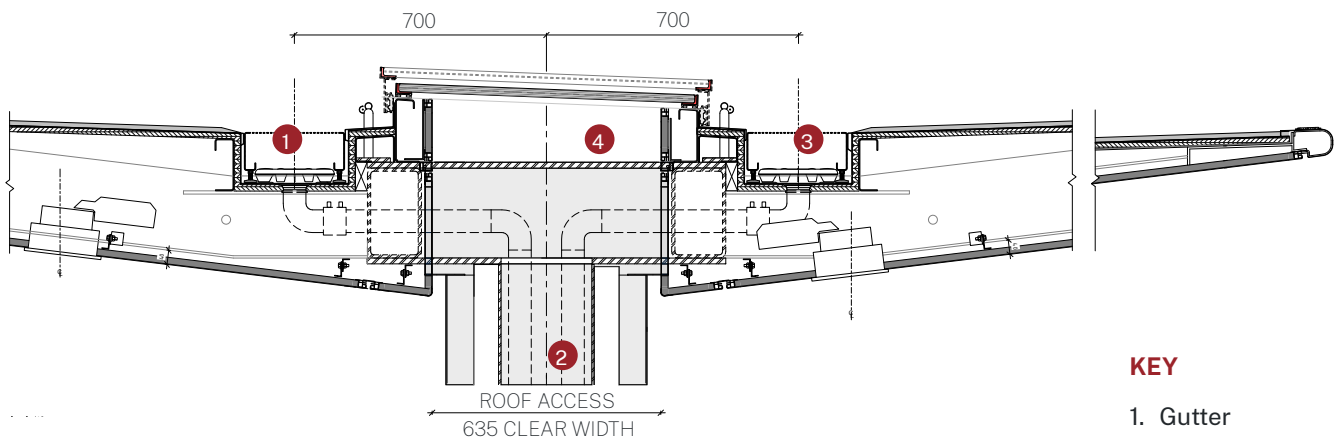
CSELR canopy drainage detail sections -larger width canopy
